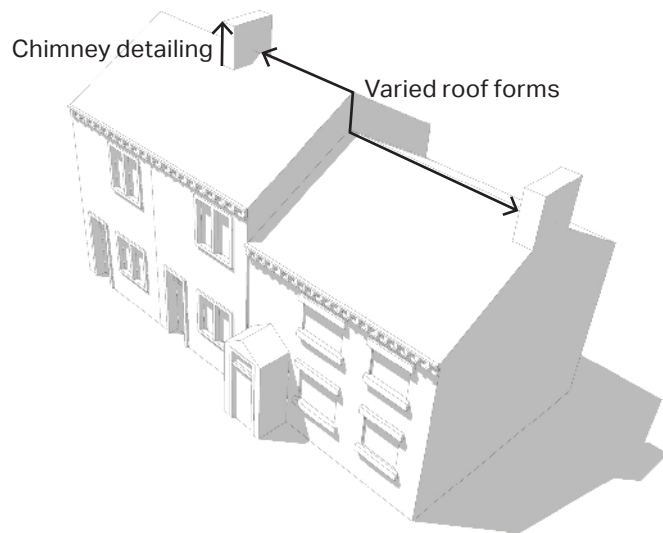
Two storey dwellings with changes in roof height and chimney detailing
